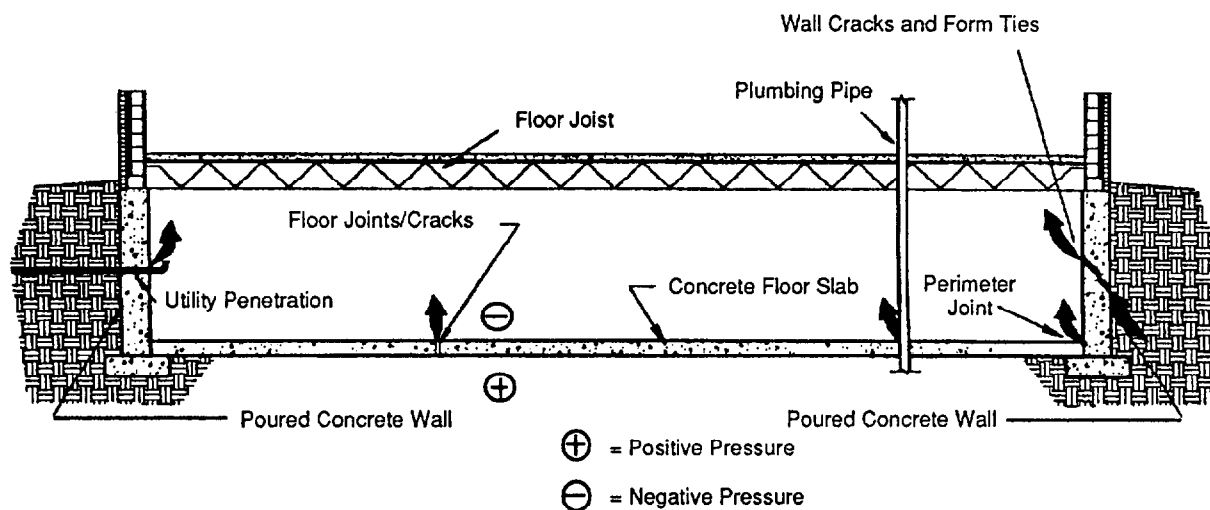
Typical radon entry routes in poured concrete basement walls.
